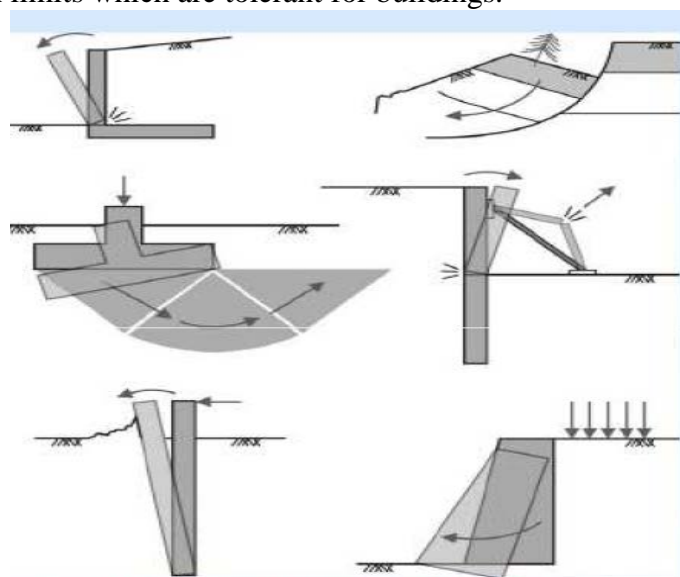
Deformation of the structure, including the foundation, basement walls, etc.
